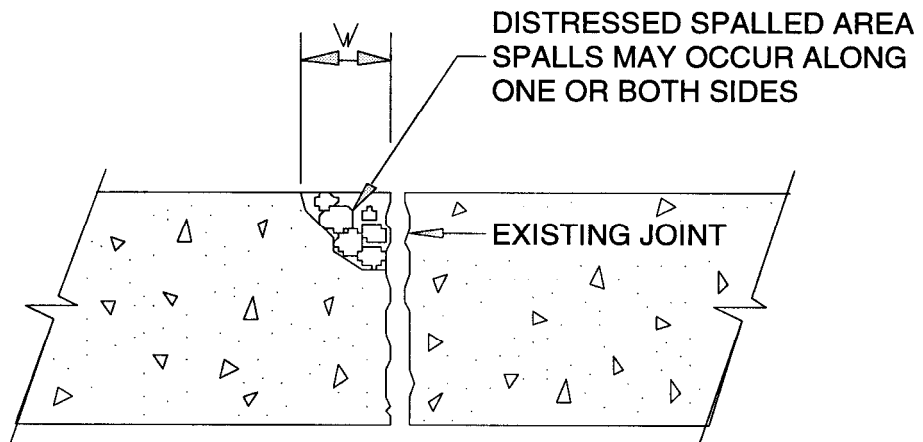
Existing Partial Depth Spalled Joint
